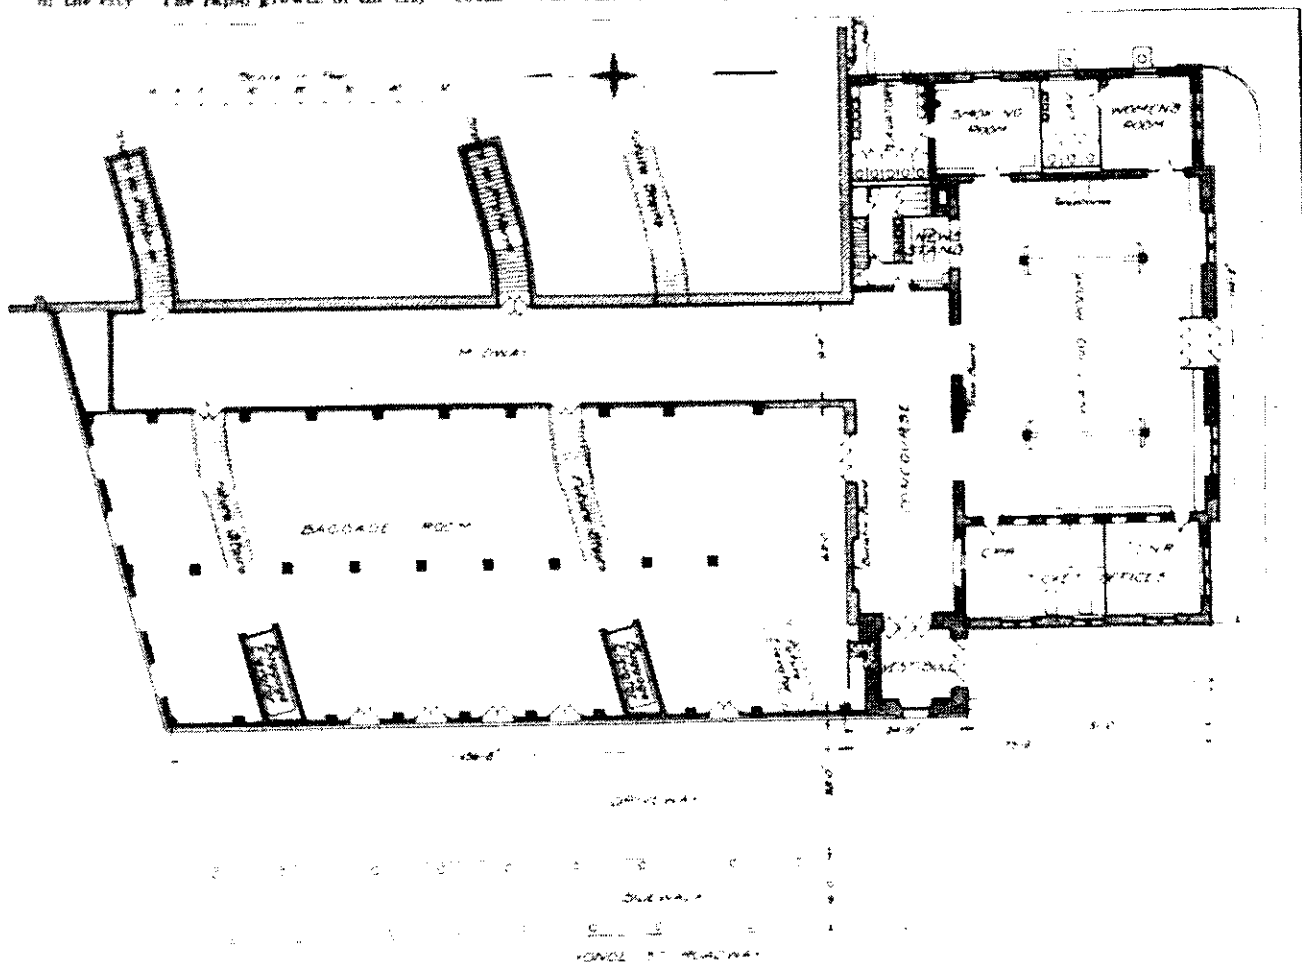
Ground Plan, North Toronto Station, Canadian Pacific Railway.
